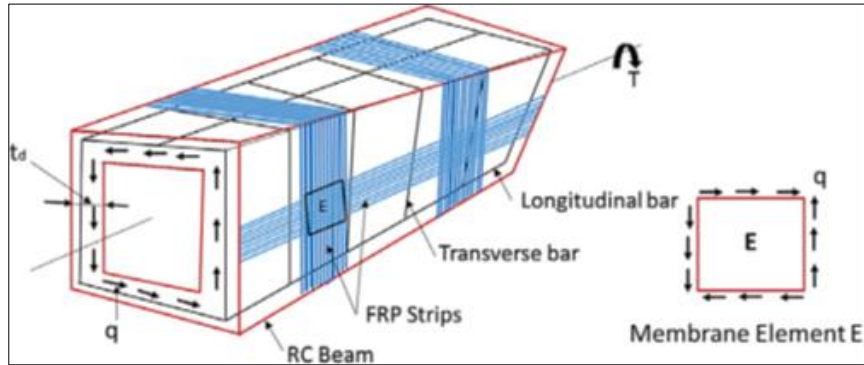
FRP-Wrapped RC Beam under Torsion and Membrane Element E
